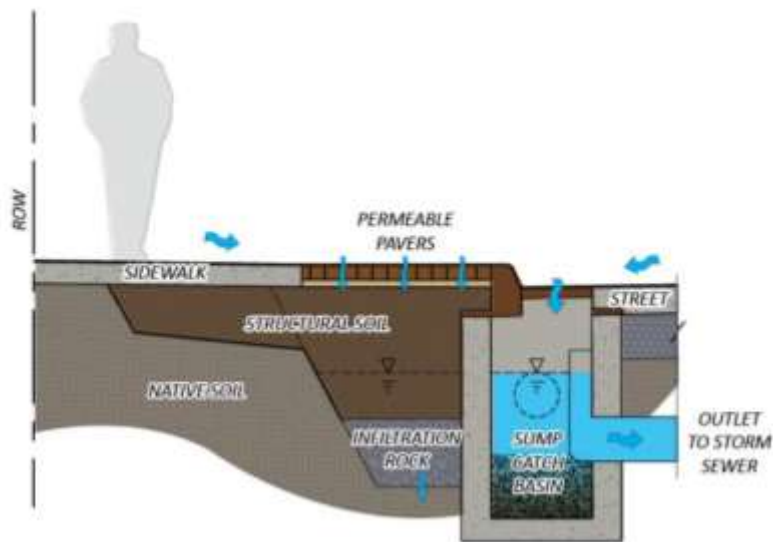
Cross-section of the St. Paul Green Line Stormwater Tree Trenches.
